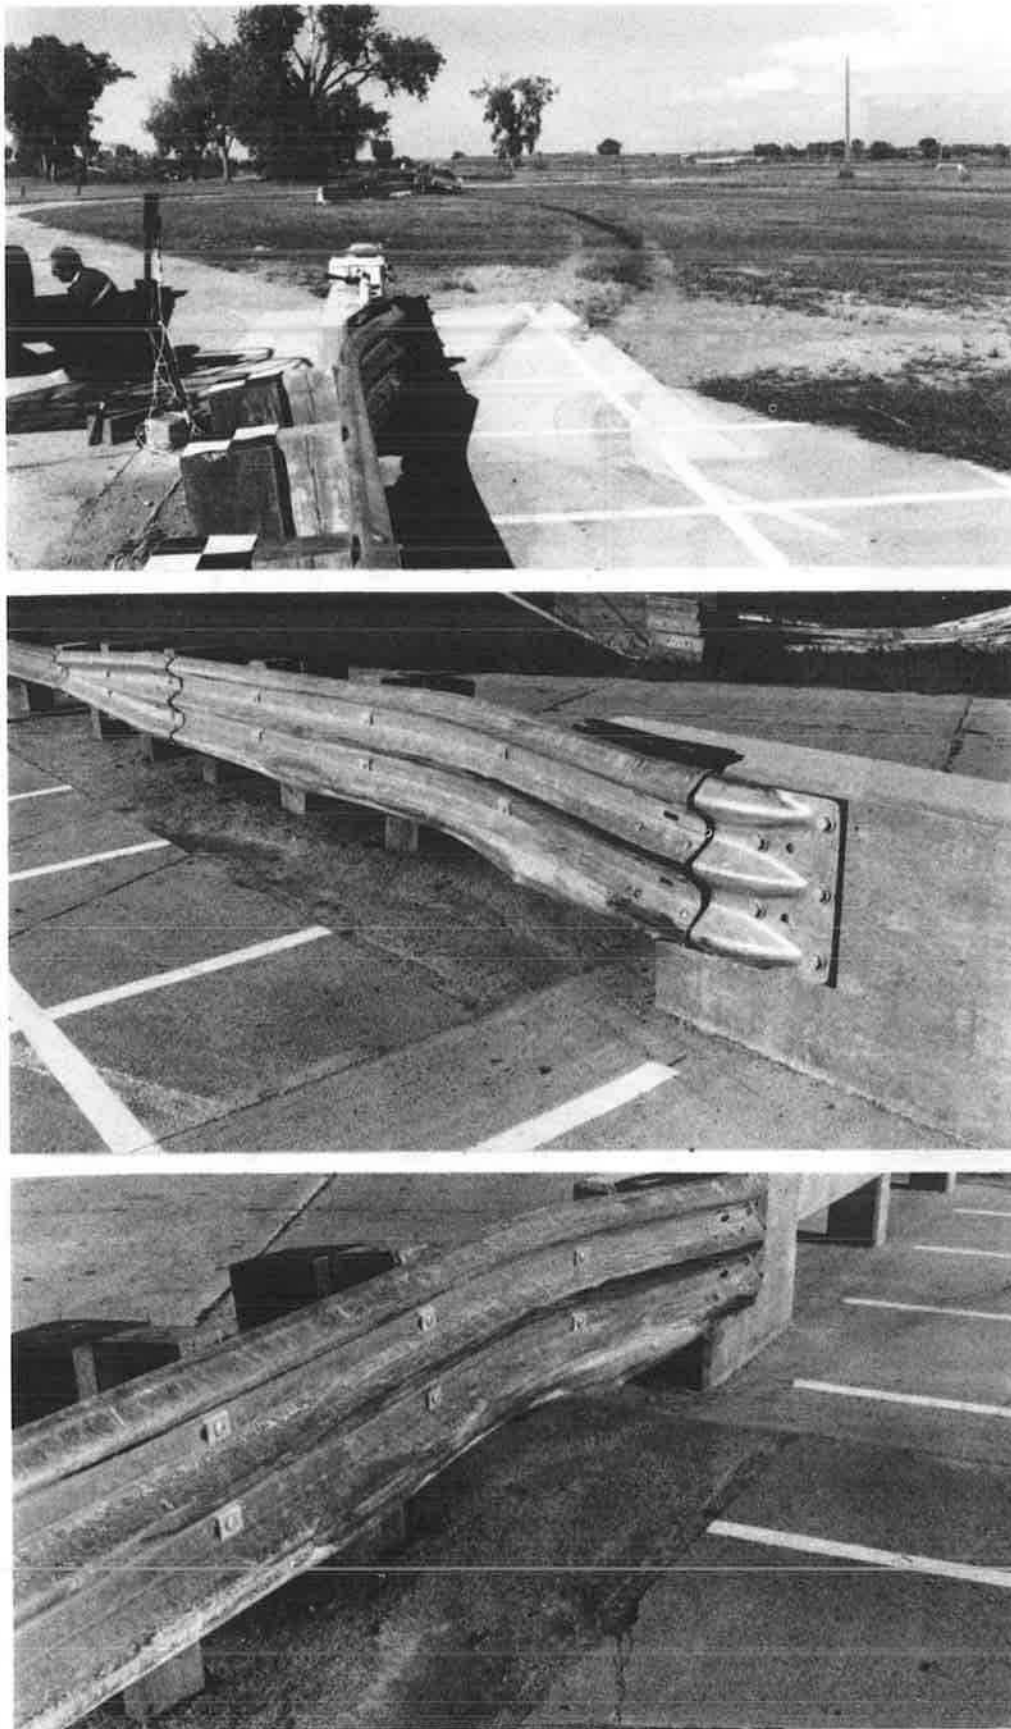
Photographs of test No. 3 guardrail damage.
